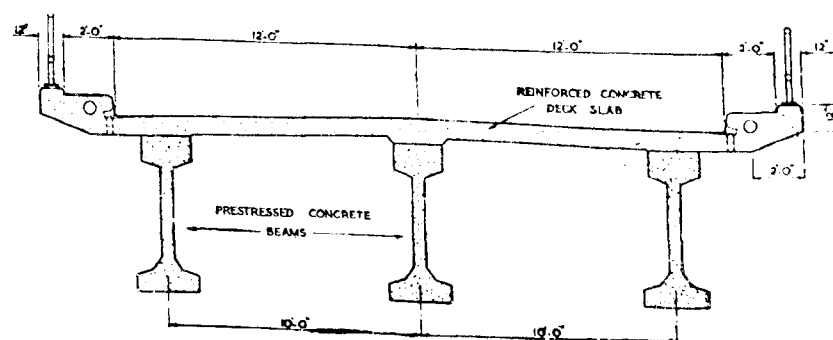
Cross section Jackadgery Bridge, New South Wales. Two spans of 95 ft and seven of 105 ft
